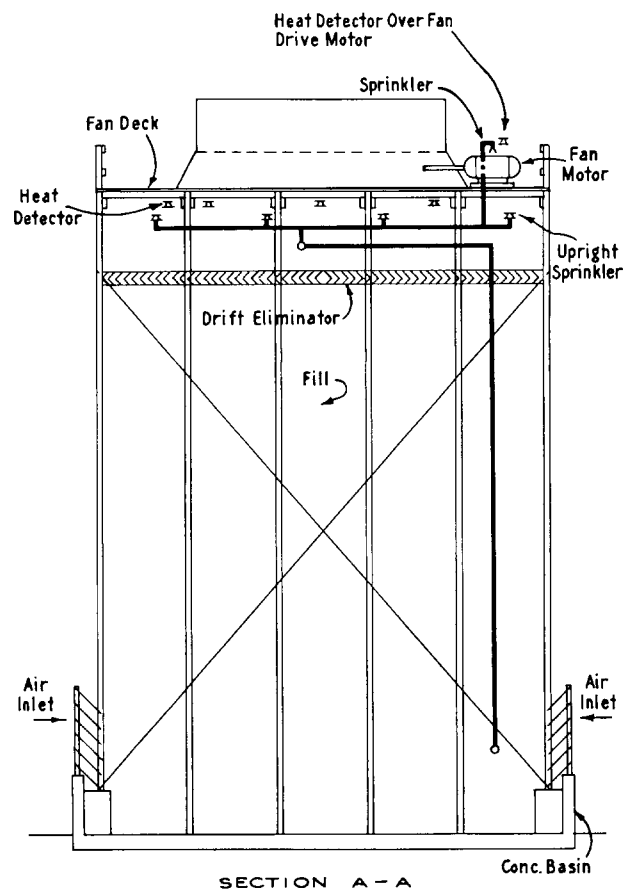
Typical deluge or dry-pipe fire protection arrangement for counterflow towers.
